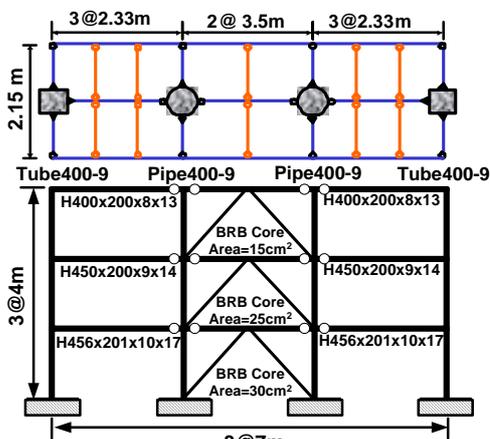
(a) Plan and elevation of the full-scale CFT/BRB composite frame
